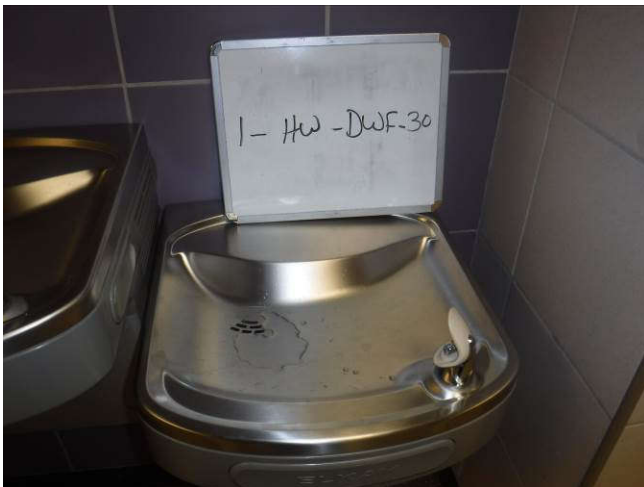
Drinking water fountain, located in a 1st floor hallway across from room 122 next to 123 (right fixture)
